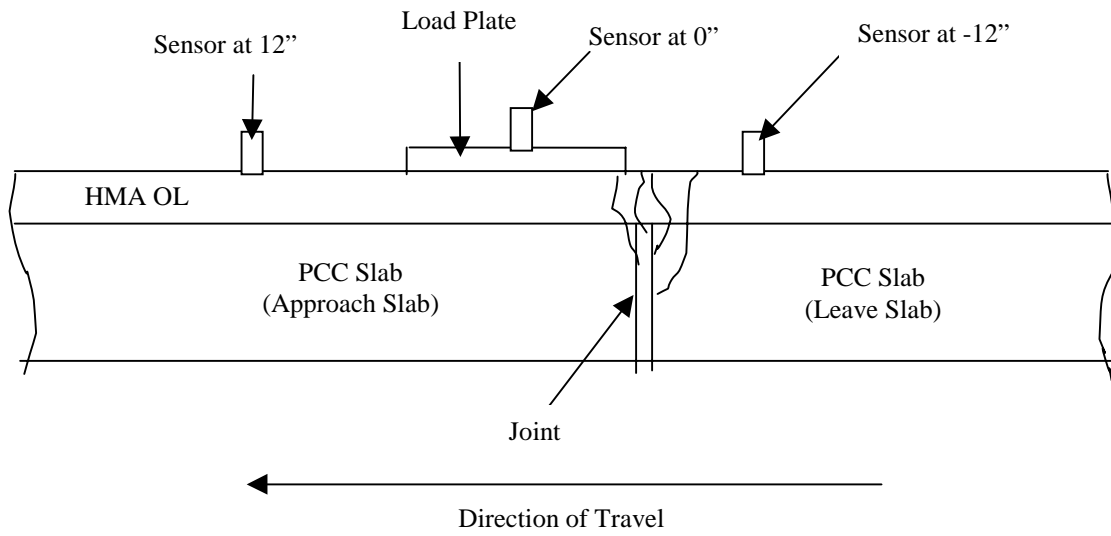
Joint Load Transfer Testing Sensor Spacing ID #7
